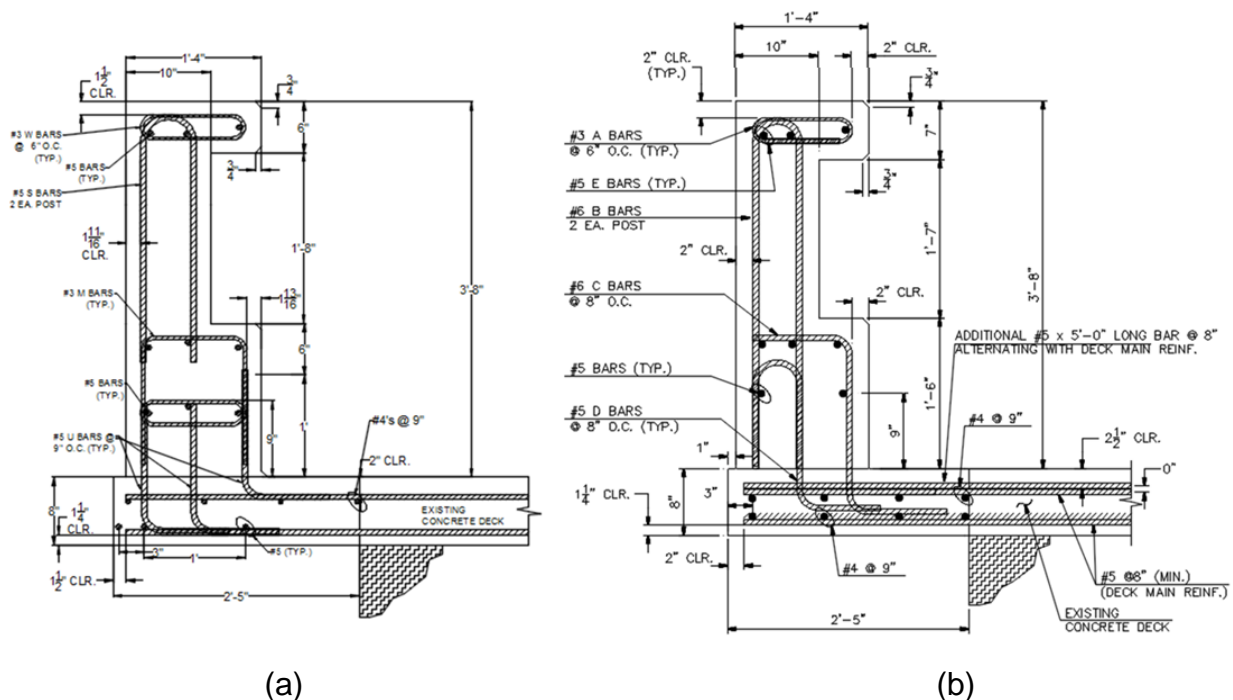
Details for open-faced balustrade design; (a) original design and (b) modified design
